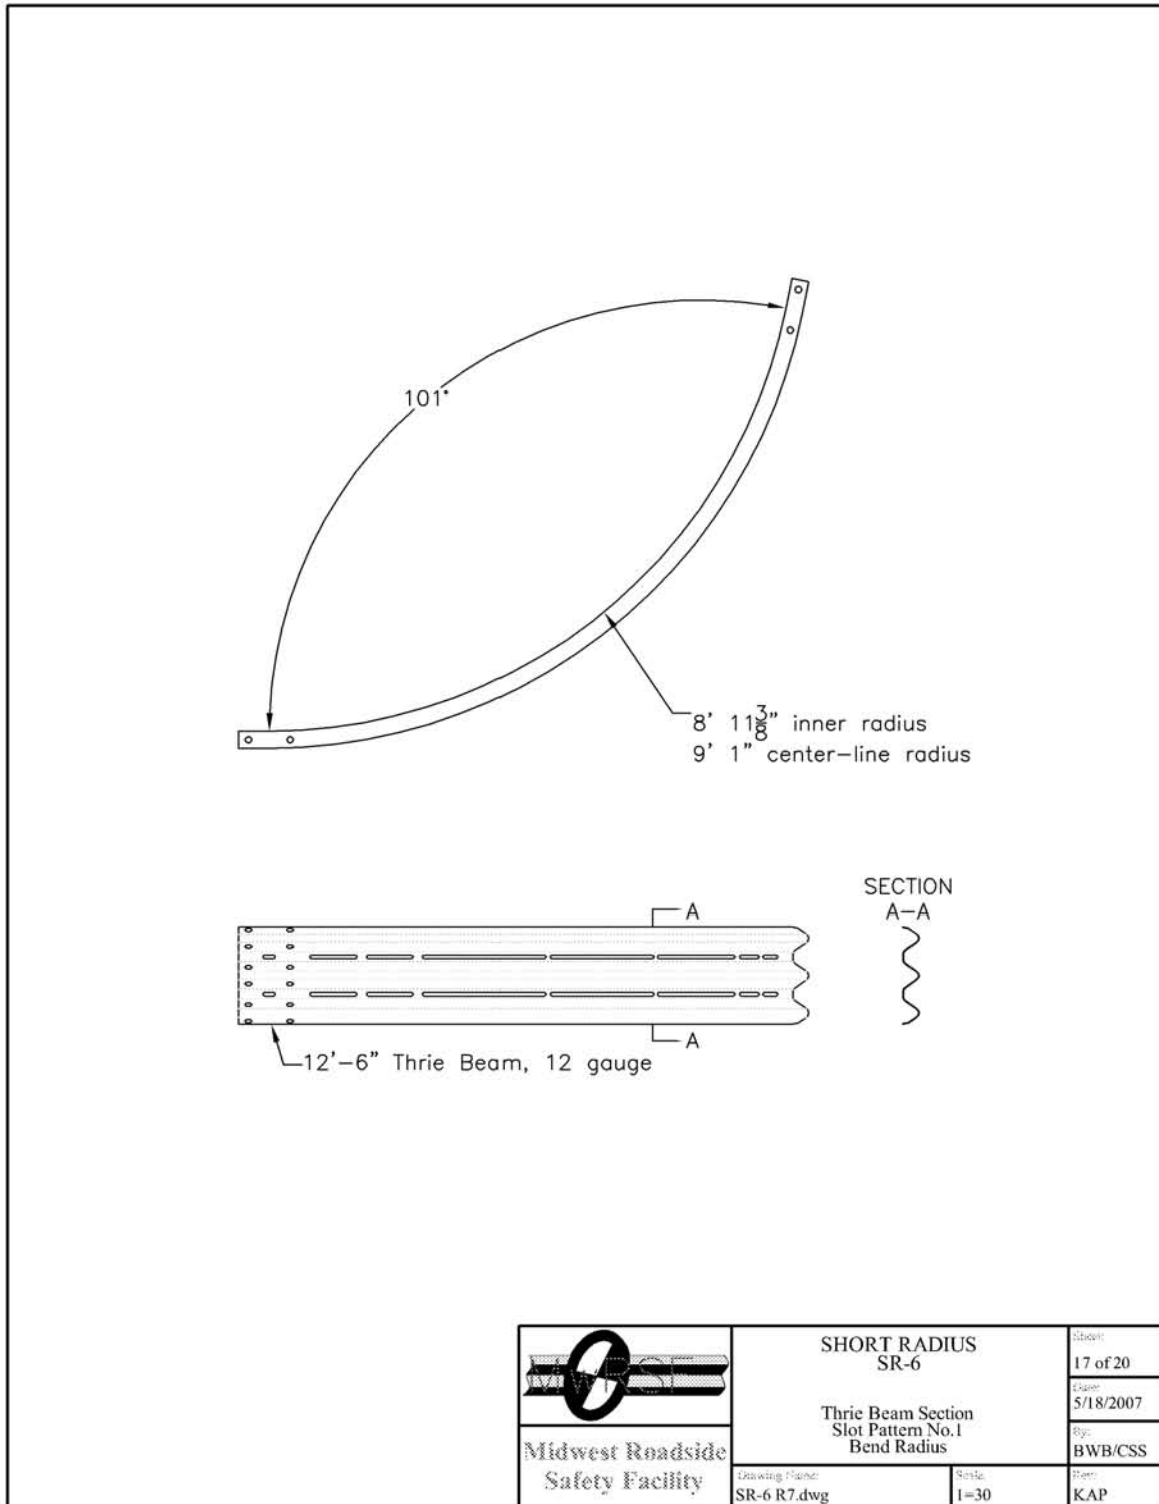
Rail Curvature, Rail Section No. 1 (English), Test SR-6
